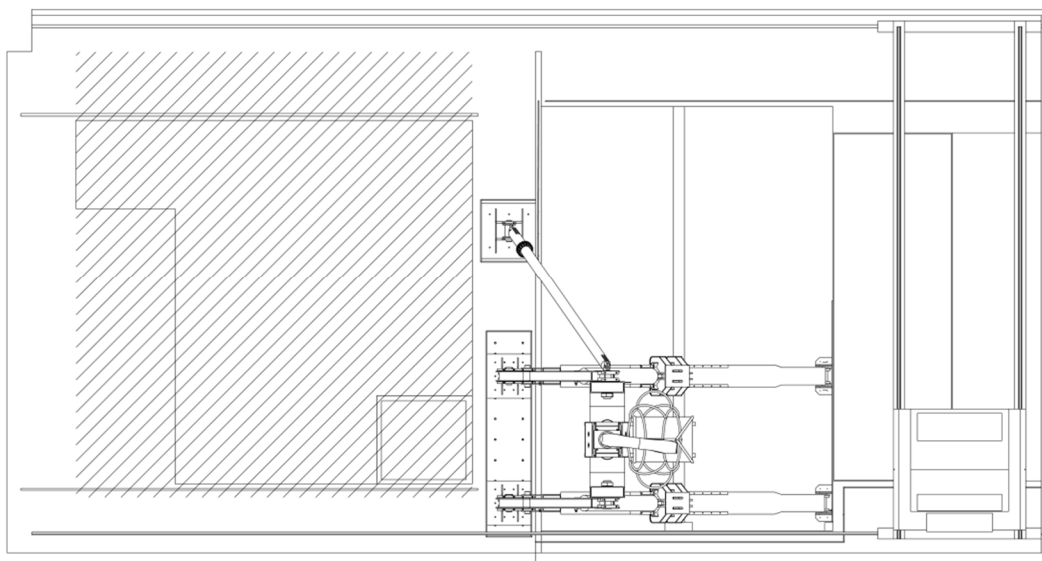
HI-LIFT Installation (Illustr.) Plan View
